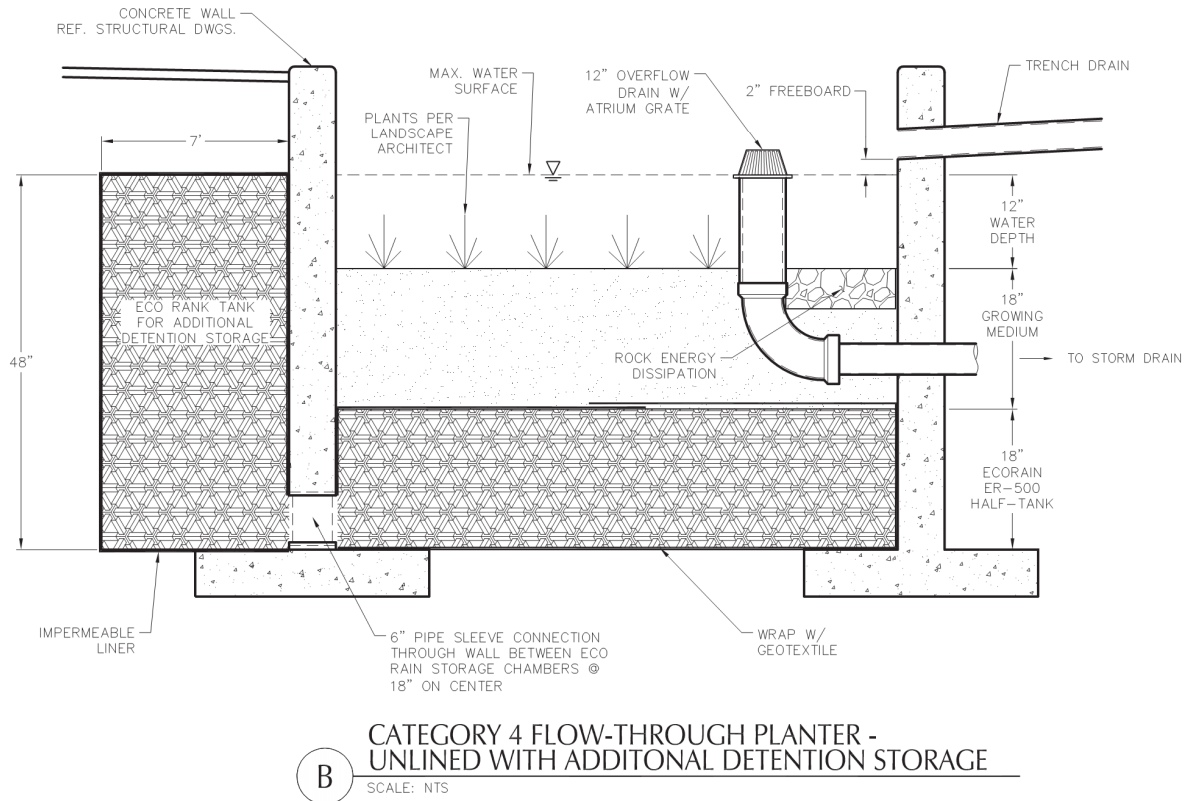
A section view showing the construction of a low impact development approach (LIDA) storm water pollution control planter.
